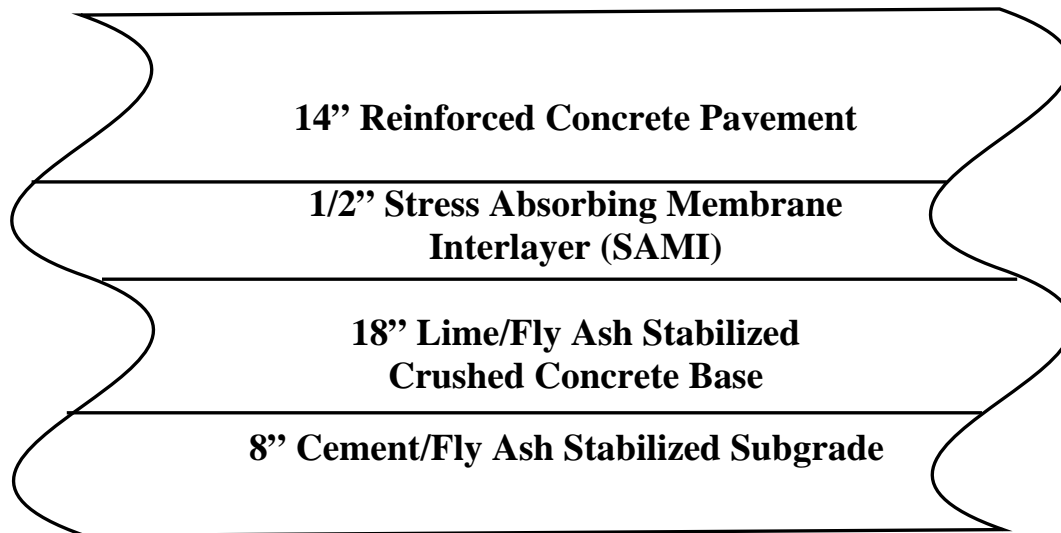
Final Pavement Cross Section for Taxiway “WP”
